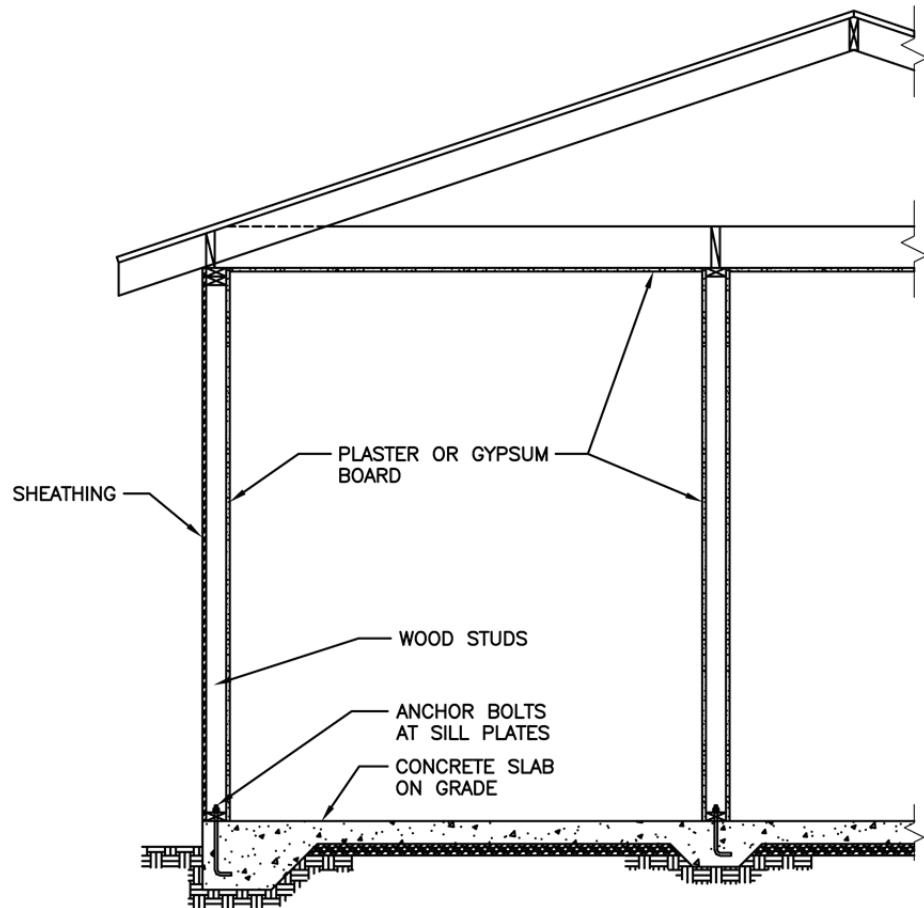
Section through typical one-story slab-on-grade house (from ATC, 2002b).
